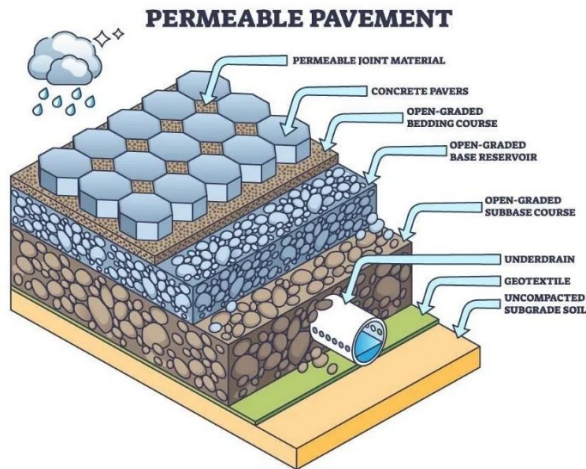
Permeable Pavement Cross-Section (Toronto 2023)
